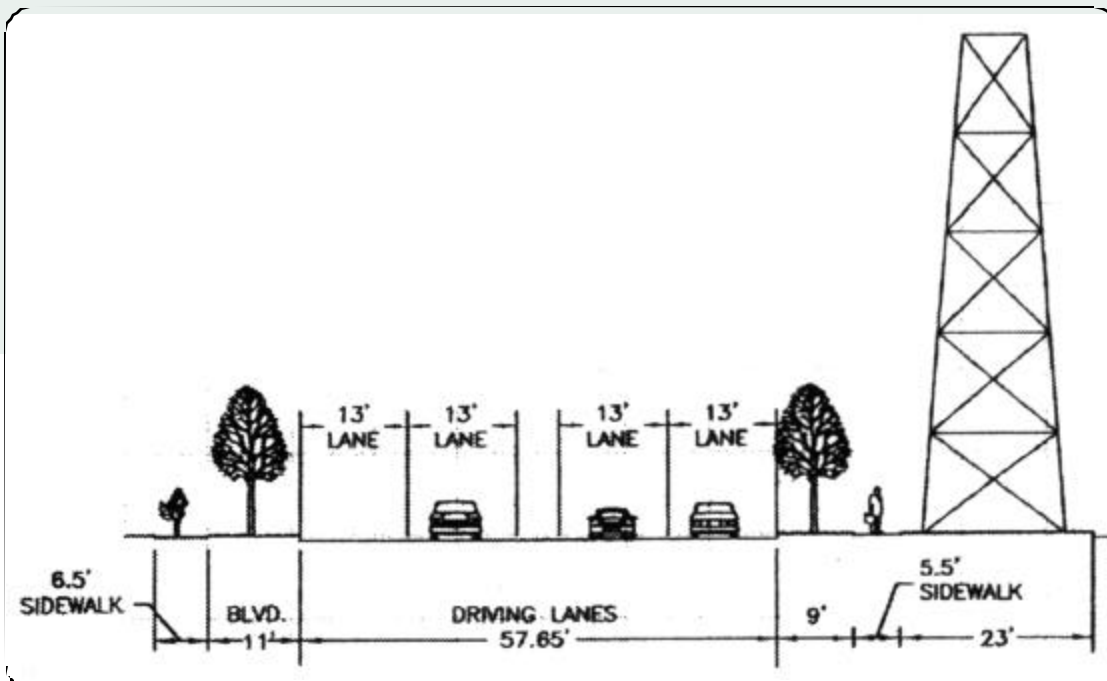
Existing street section of Hiawatha Avenue, between 46th Street and the Land Bridge, facing south.
